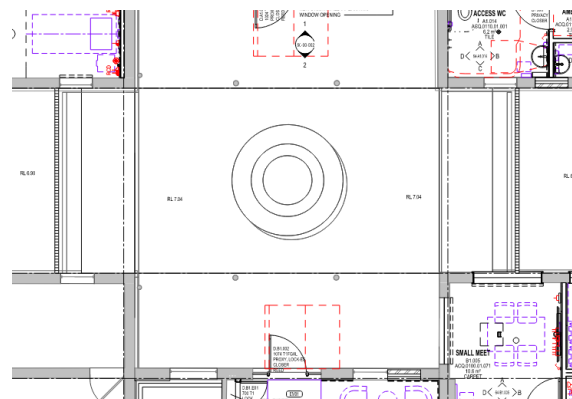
(B) EXTERNAL STEP RAMPs AT ENTRANCE TO BUILDING
